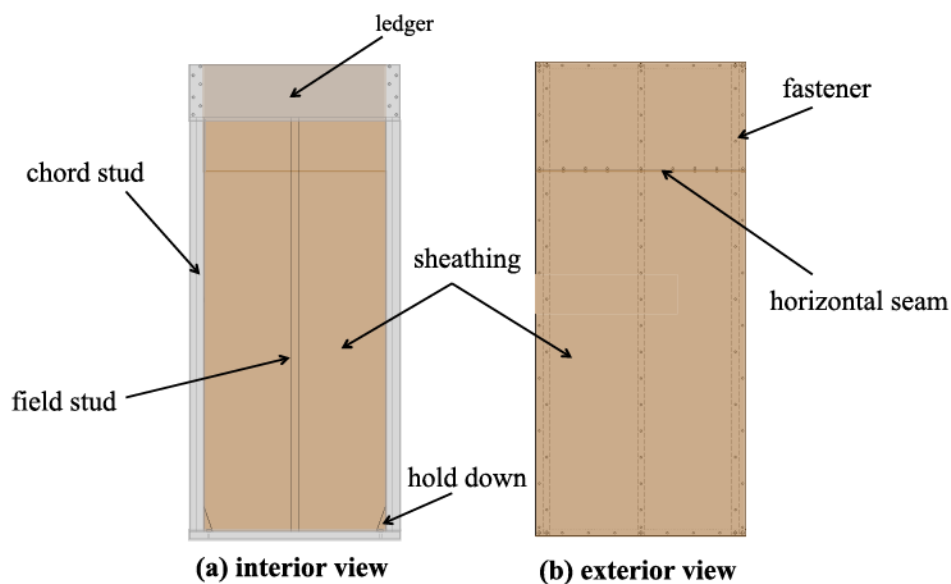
Sheathed, cold-formed steel framed shear wall
